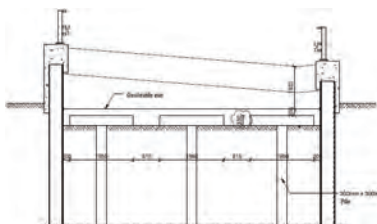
Cross section of the ramp where the road is above ground level with concrete piles and slabs to avoid settlements in the organic soil [1].
